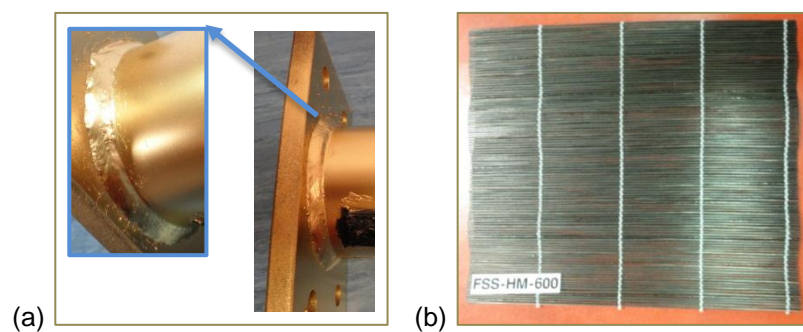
(a) Butt-weld of the tubes to the end plate, (b) CFRP.
